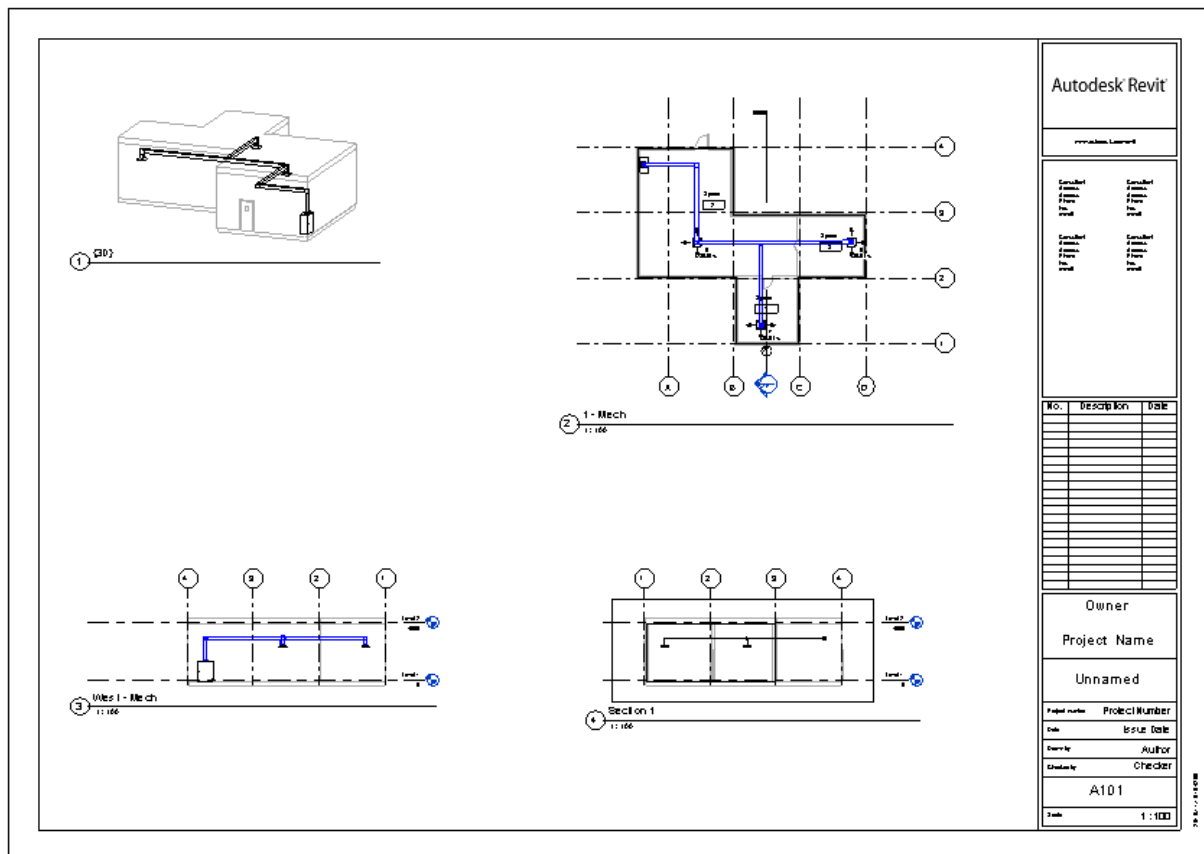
sheet generated in Revit MEP. The sheet shows in chronological order the views; 3D, Floor plan: 1-Mech, Elevation: West Mech and Section. Note that the sheet label is not according to Swedish standards. (picture extracted from Revit MEP 2011)
